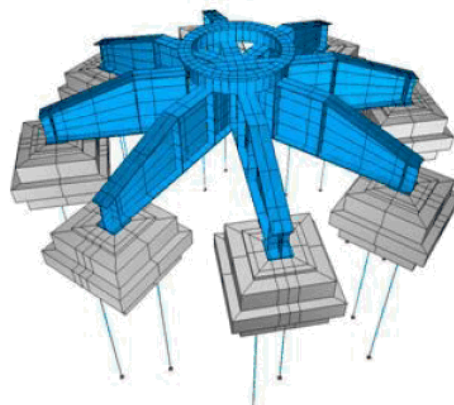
Foundations of the wind turbines with concrete blocks (grey), anchors and steel structure (blue) (IEE, 2008)
